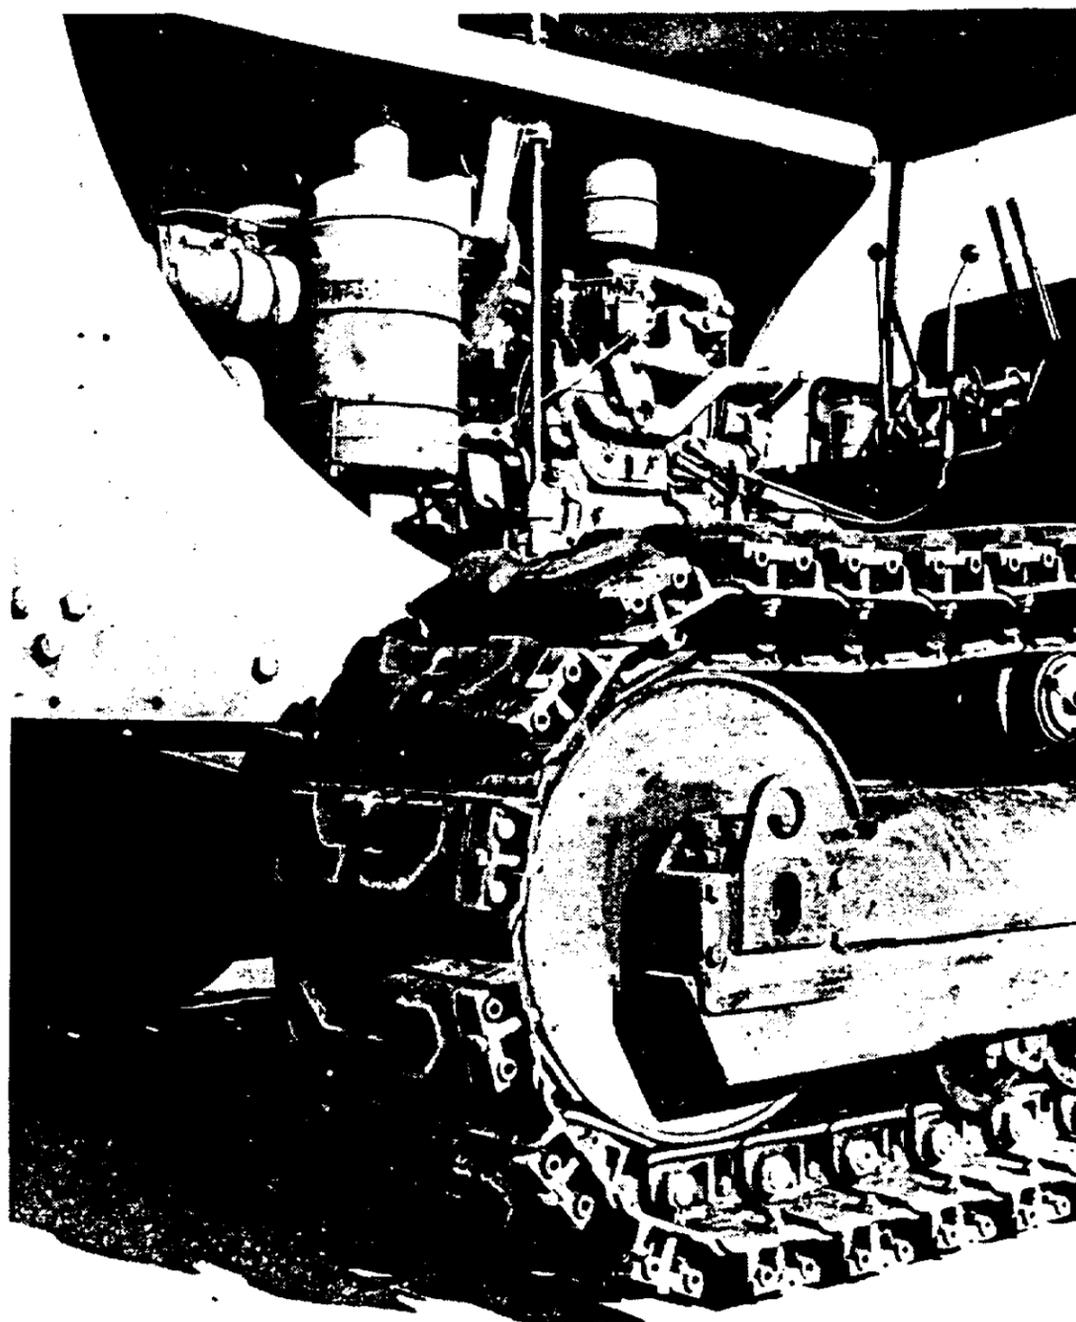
Rubber track blocks used to protect improved surfaces.
